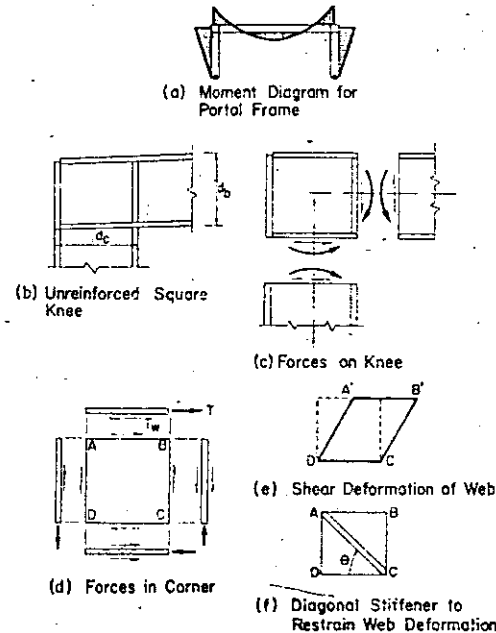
STRAIGHT CORNER CONNECTIONS
